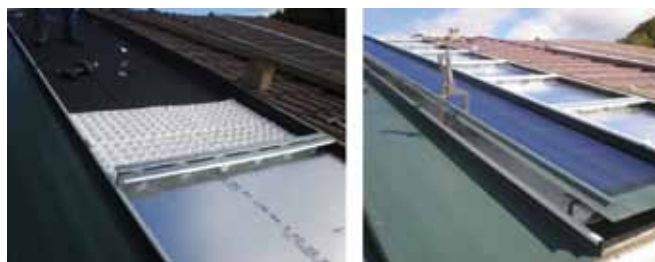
Installation of PCM cells topped with reflective foil-faced fiberglass and roofing panels.
